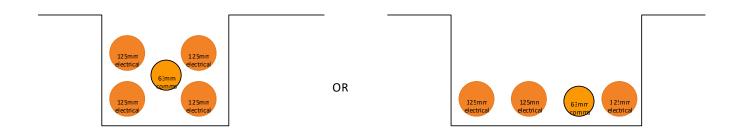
TYPICAL CONDUIT INSTALLATION DETAILS
